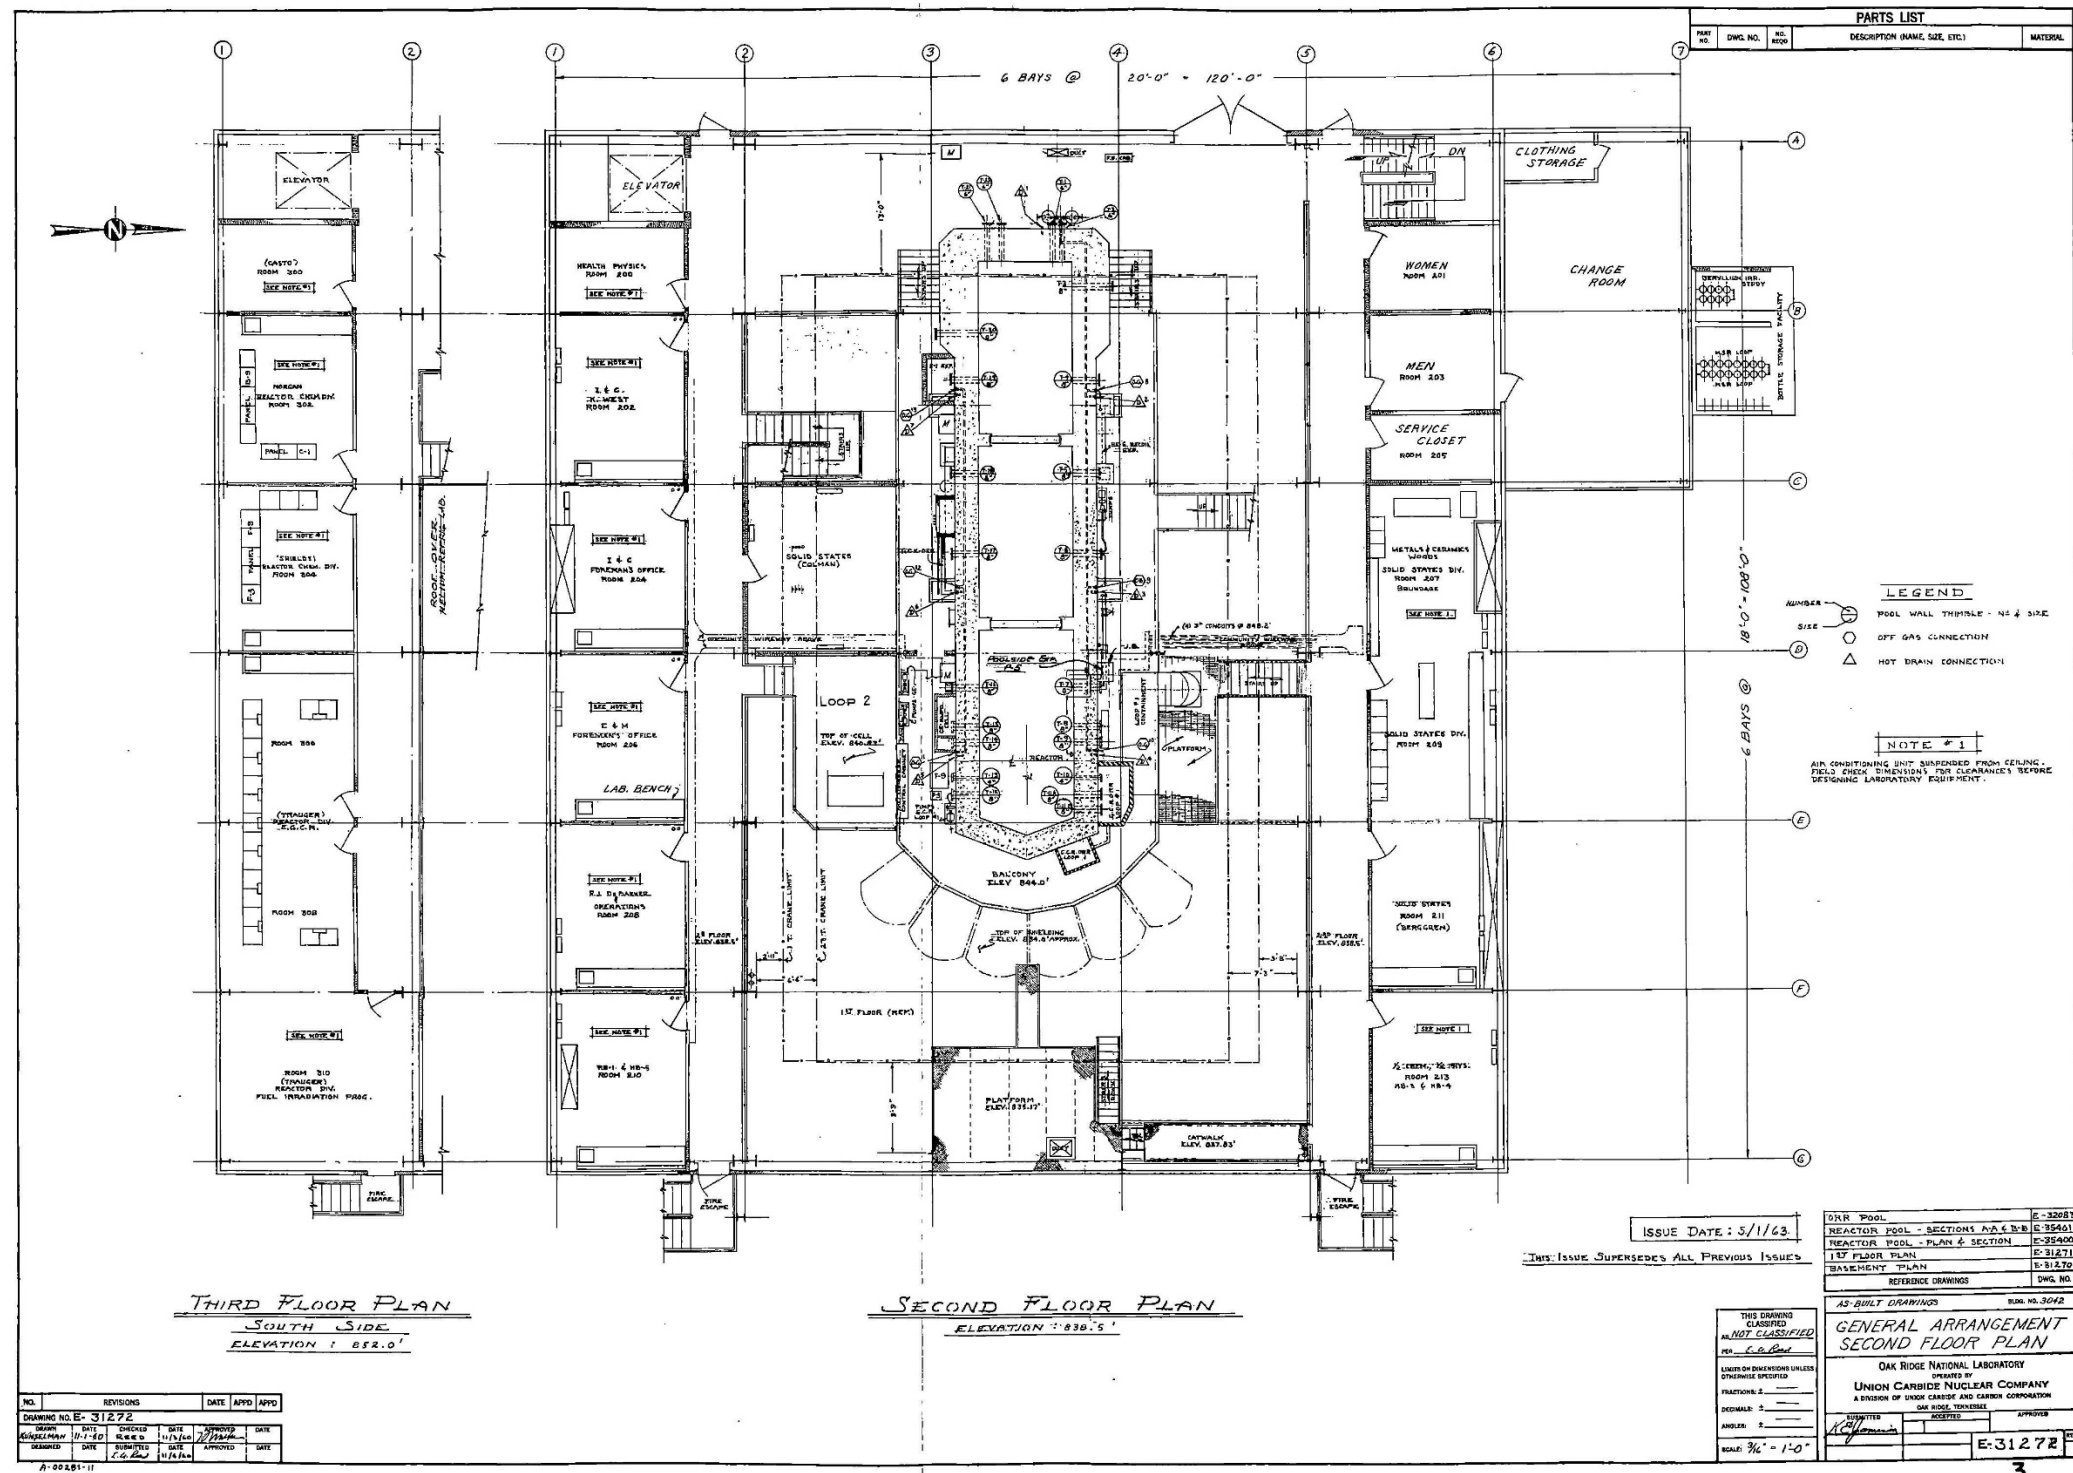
As built drawing showing the general arrangement of the second floor plan as well as the third floor plan for the south wing in Building 3042 (Oak Ridge National Laboratory, November 1, 1960 [drawn date], May 1, 1963 [issue date, with revisions]).
